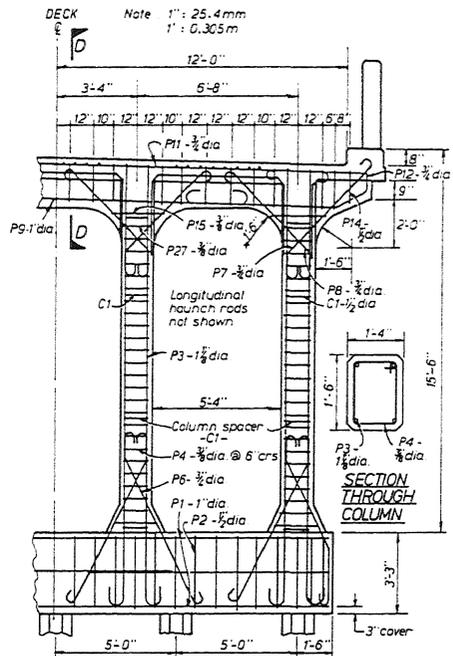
Details of reinforcement in a New Zealand bridge pier designed in 1936.
